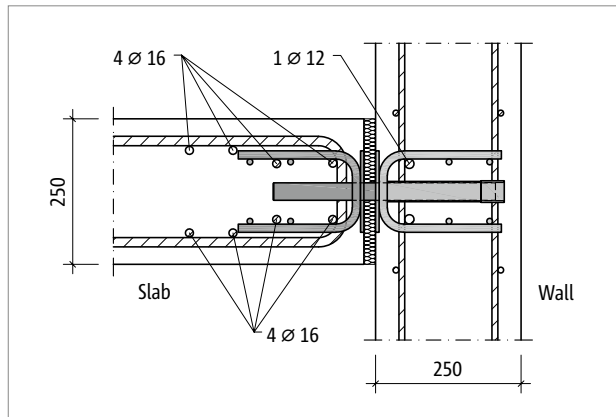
Section through floor-wall connection showing reinforcement set-up
